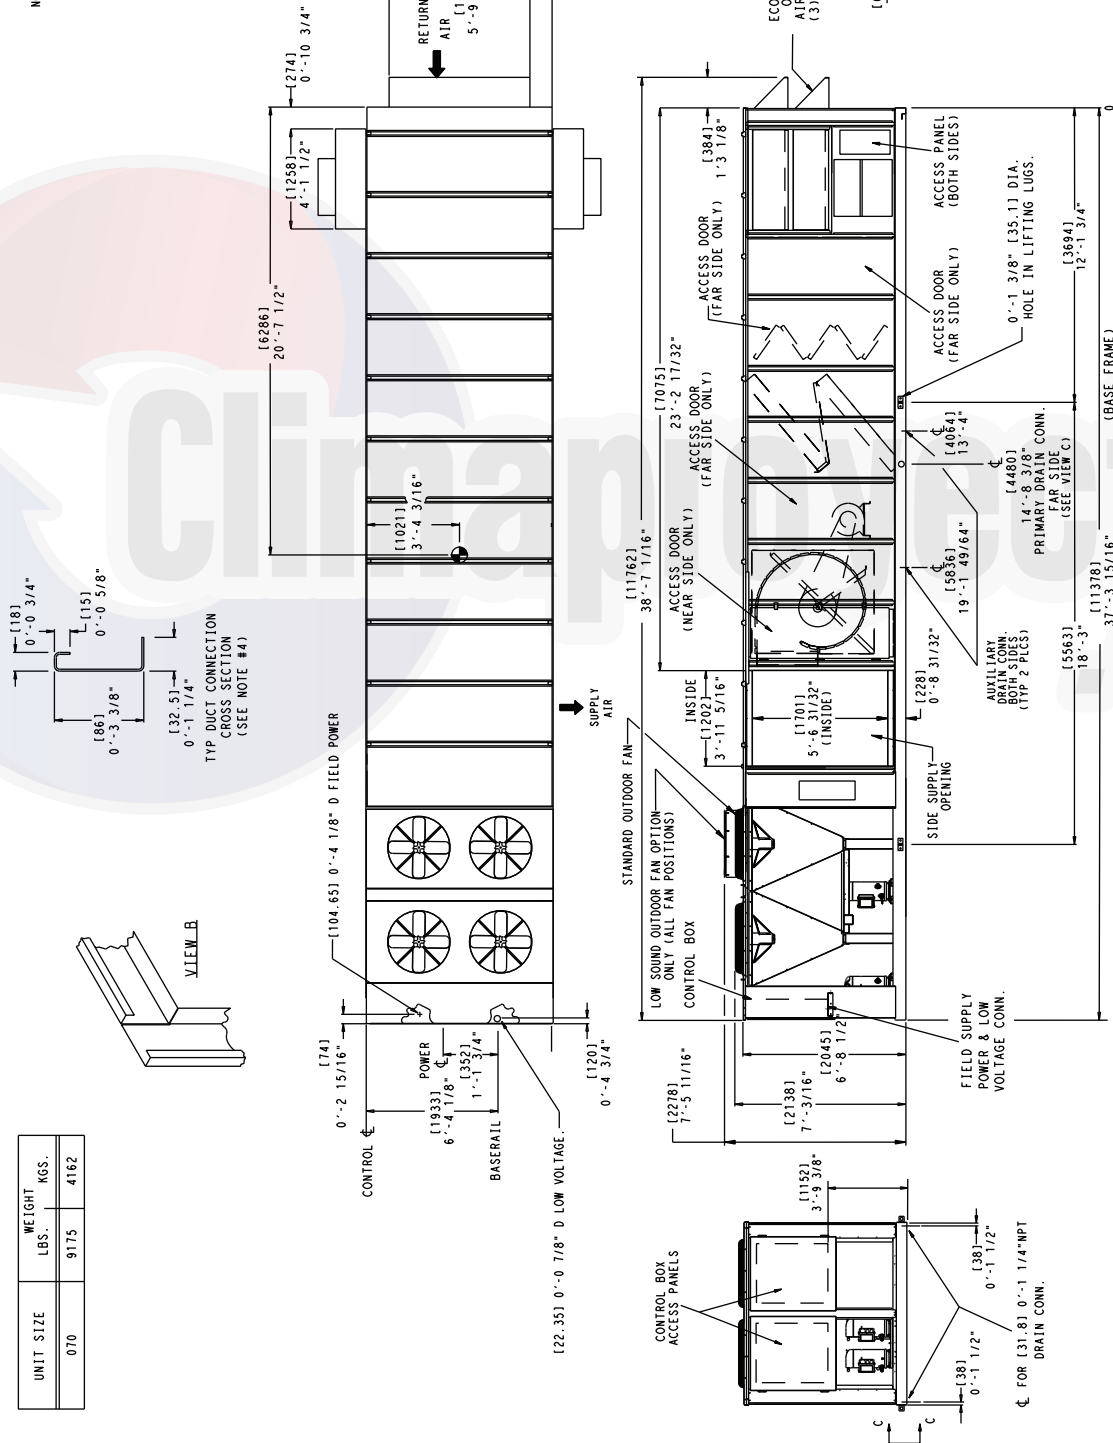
Base Unit Dimensional Drawing — 50P4,P5,P8,P9070 (Standard Chassis Unit Shown)
